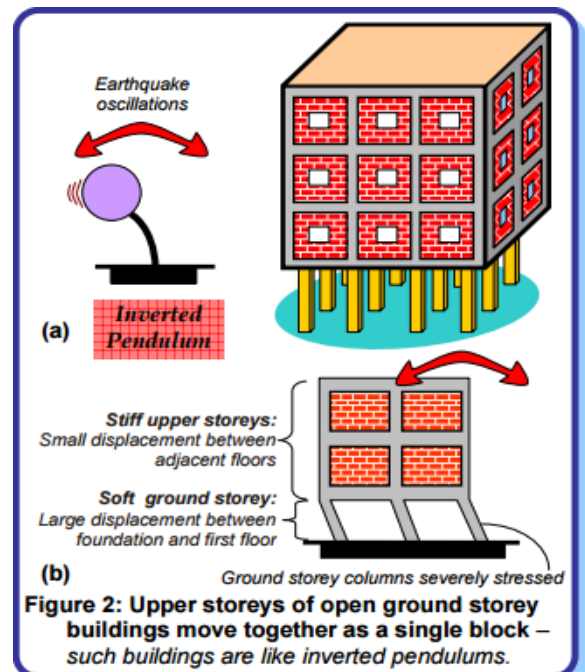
Upper storeys of open ground storey buildings move together as a single block – such buildings are like inverted pendulums.
